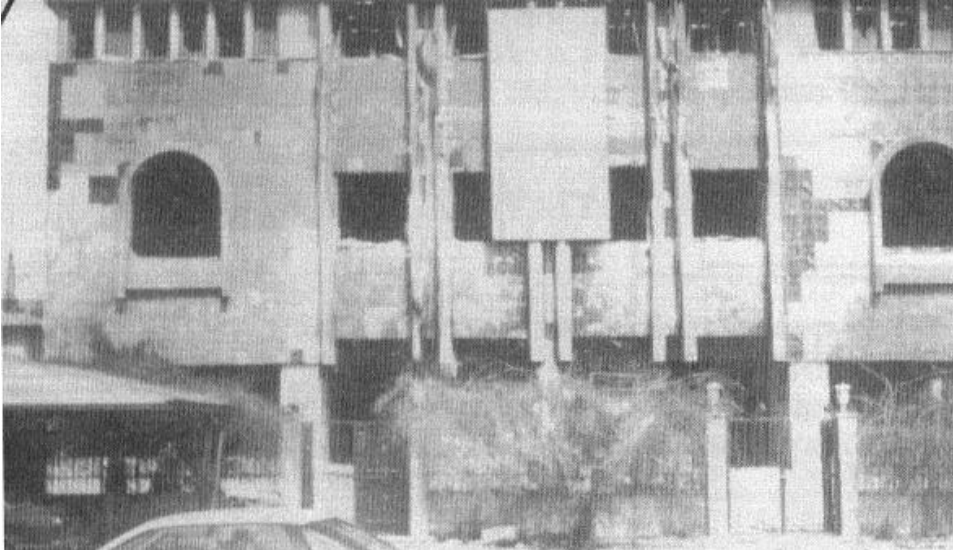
House in Jabriya district of Kuwait built with a reinforced concrete (RC) frame, with infill masonry walls, subjected to a severe fire.
